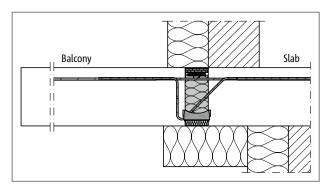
Schöck Isokorb® T type K: Connection with indirectly positioned floor and WDVS
